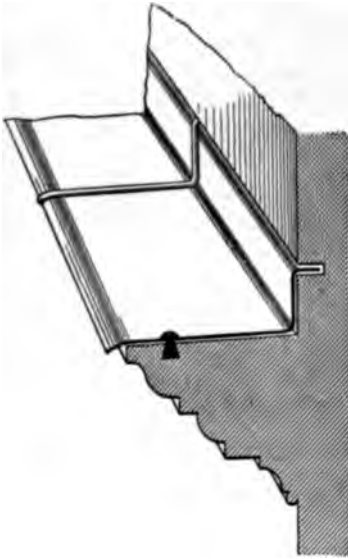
Welded Seam in Lead Covering of Cornice
